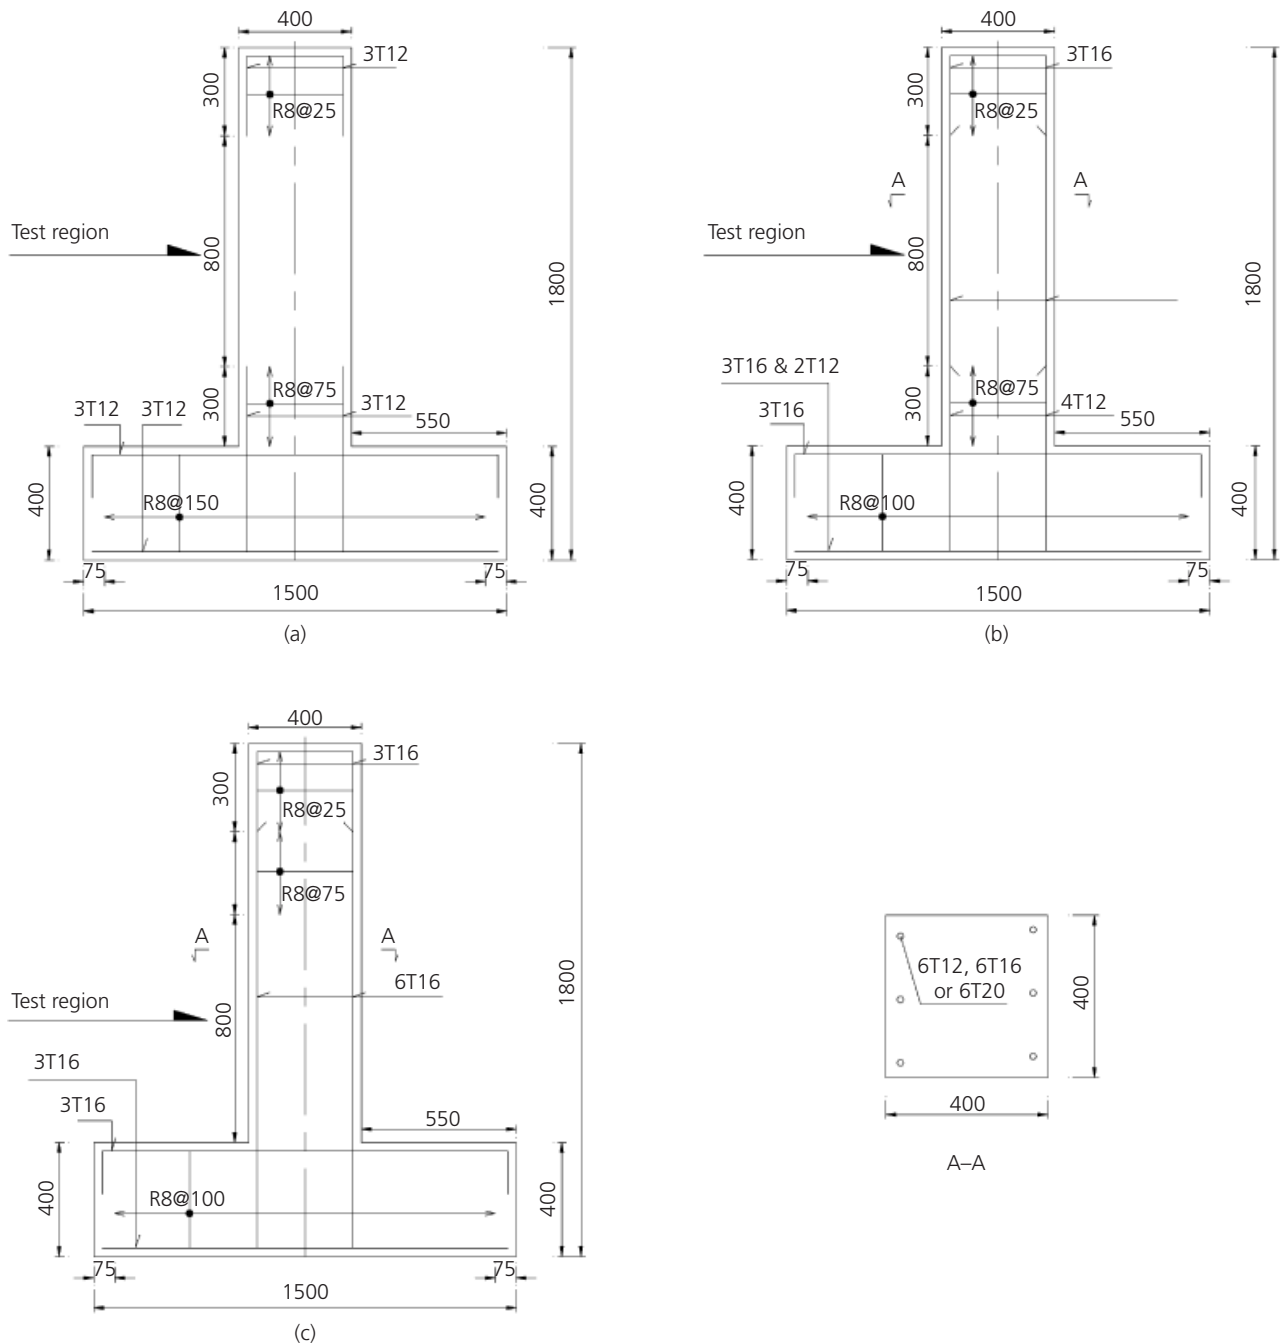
(a) PC specimen. (b) Eccentrically loaded RC specimen. (c) Horizontally loaded RC specimen. Dimensions in mm
